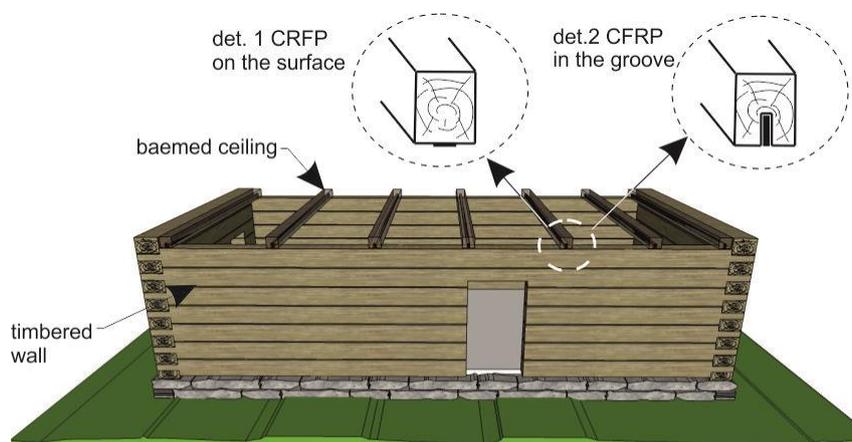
Securing the spatial rigidity of a timbered construction in the case of degraded tie beams – reinforcing FRP strips or lamellae are led along the surface or in the groove of joists and anchored to the outside
